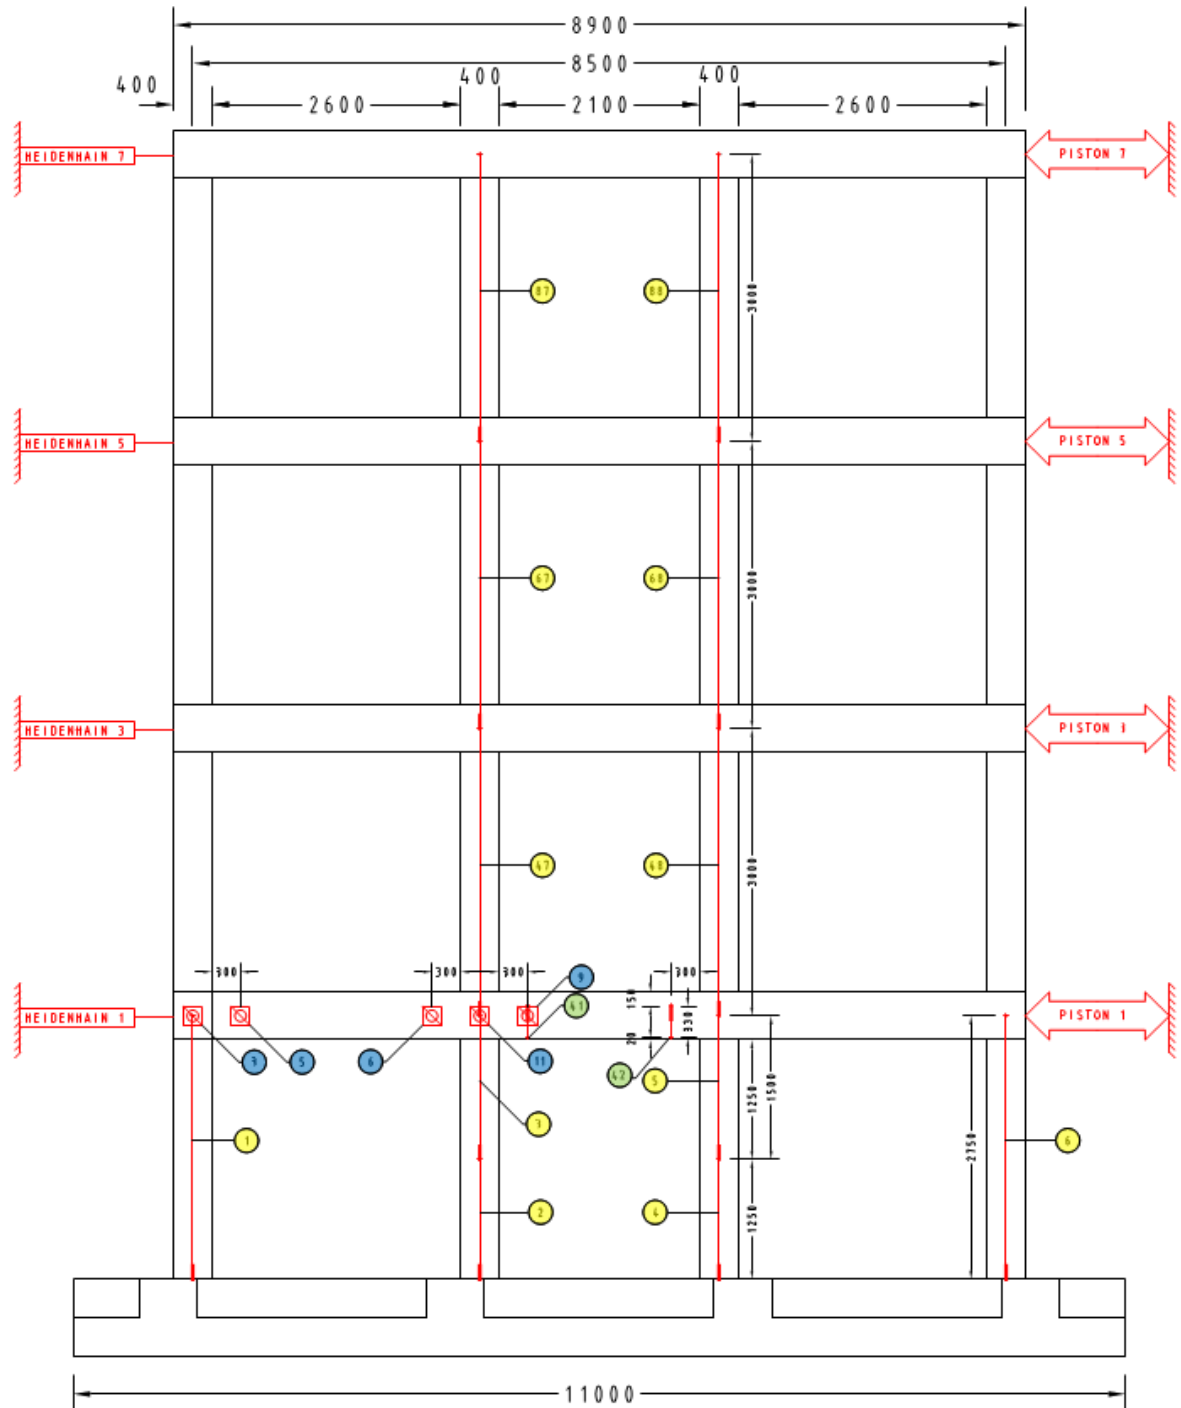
Instrumentation of the south wall outside (Poljansek *et al.*, 2014)
